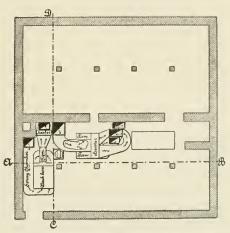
Chicago Telephone Company. Plan of ventilating plant.
